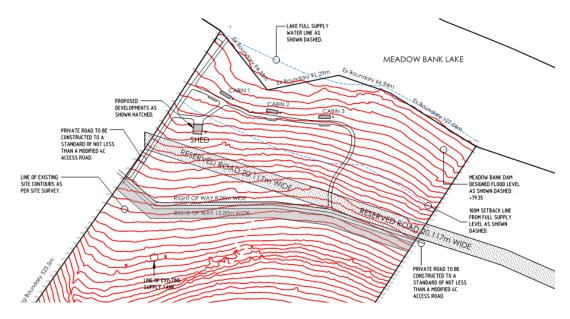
Plan of proposed development (Source: DA2022/05 StudioKo architecture design & drafting)
